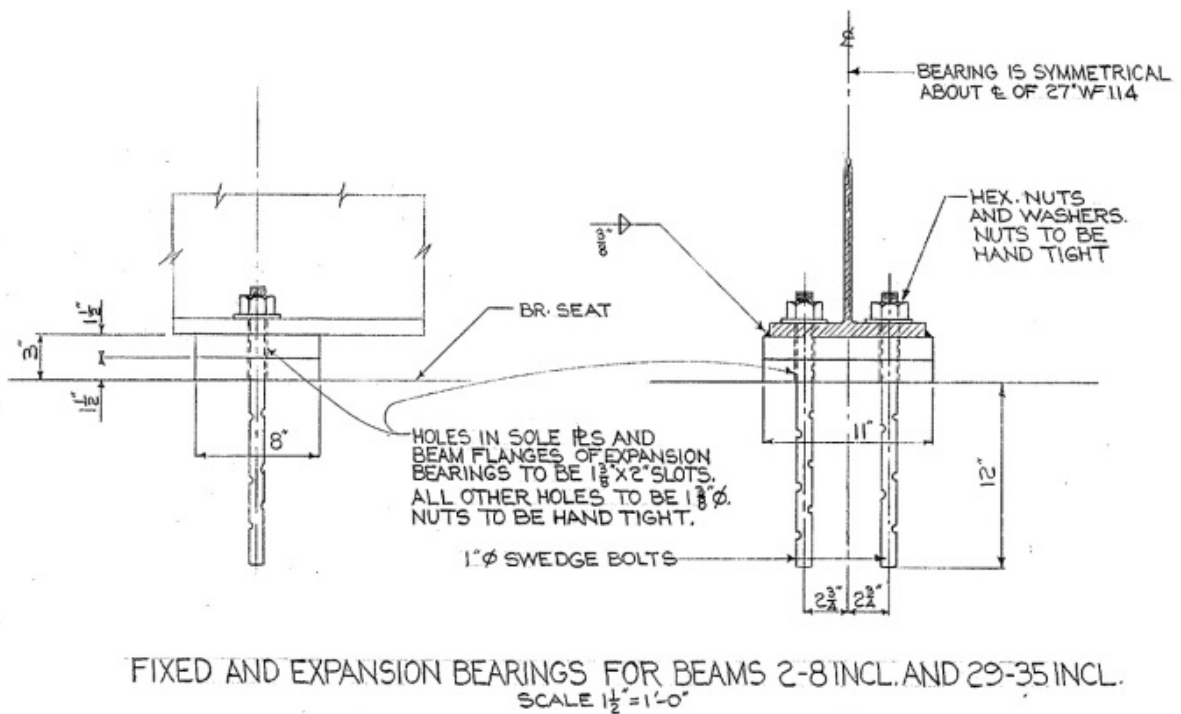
Bearing drawing details from F-2-42, showing bottom flange of girder, the two bearing plates, and anchor bolts. Note describes holes, which allow the longitudinal translation.
